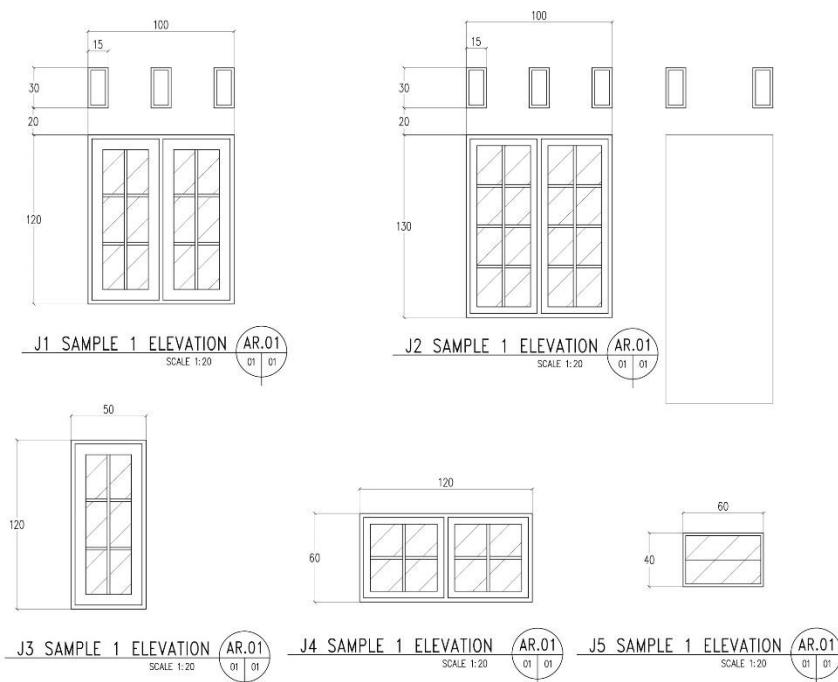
Openings Detail and Elevation of Sample 1 House (North & Elevation)
